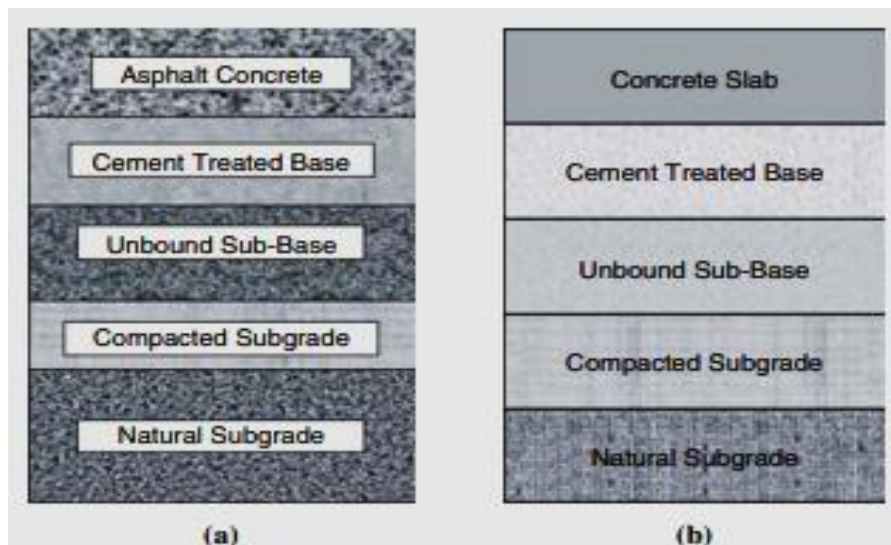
Structure of pavement with stabilized layer under (a) flexible pavement and (b) rigid pavement (Saxena et al., 2010)
